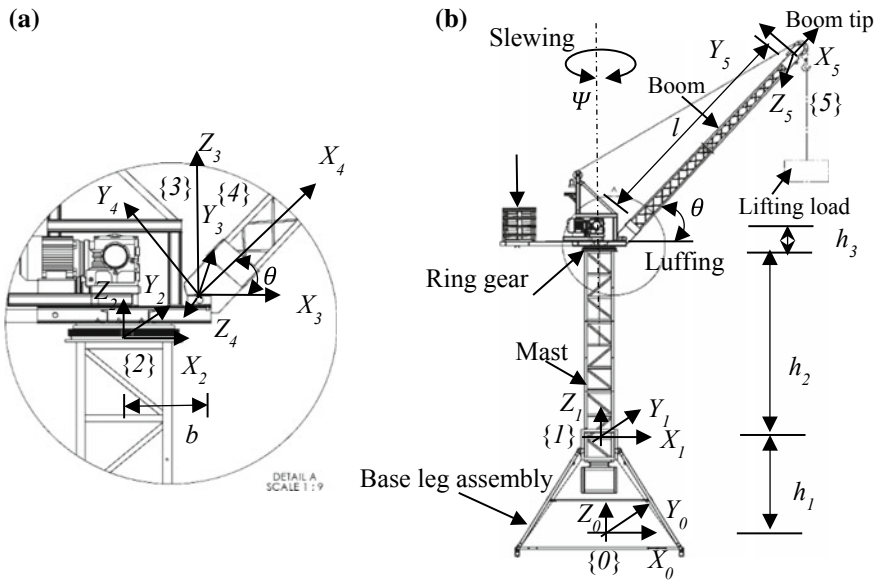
Mini climbing crane for kinematic model, a detailed view of ring gear and boom mounting, b overall schematic
